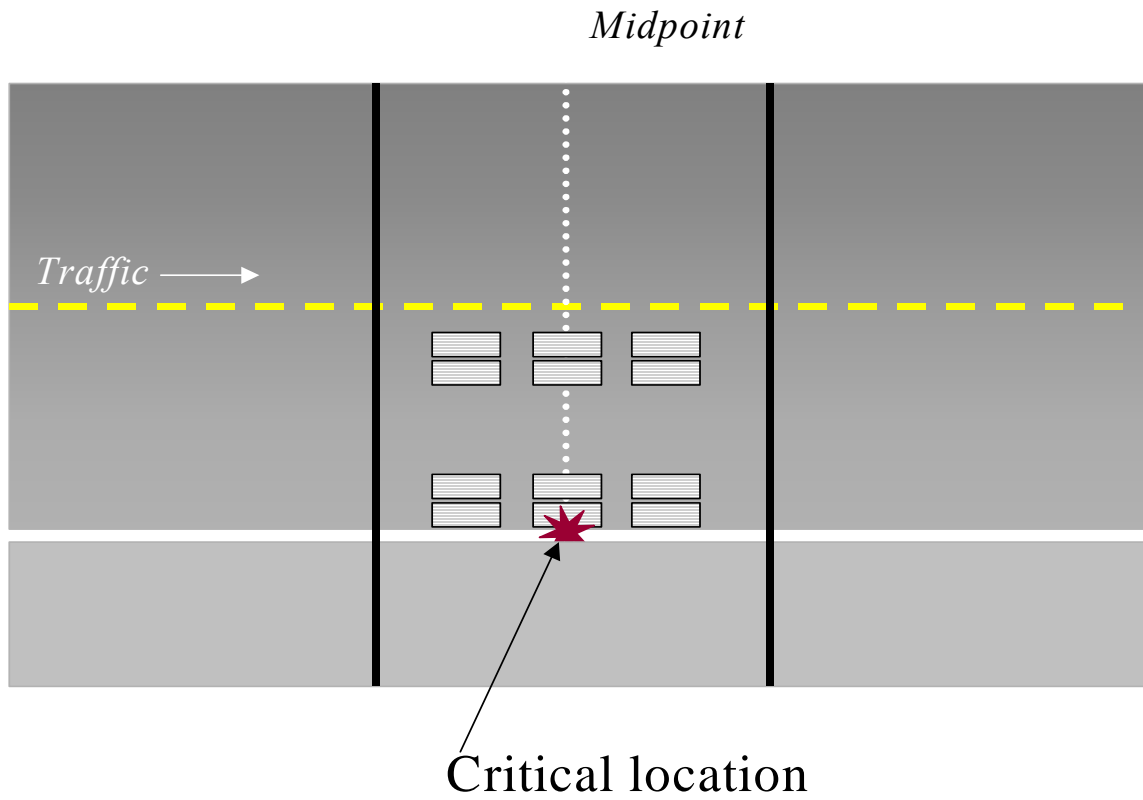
Critical tridem axle position for bottom-to-top cracking.
